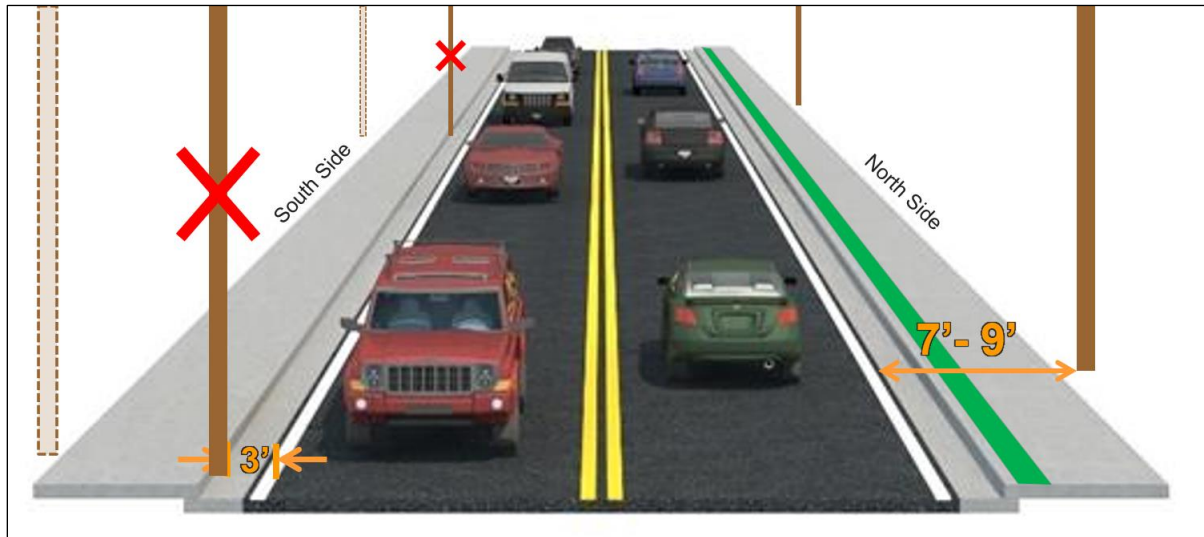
Concept 2B - Two Lane with Curb and Gutter plus Sidewalks - North and South Sides
